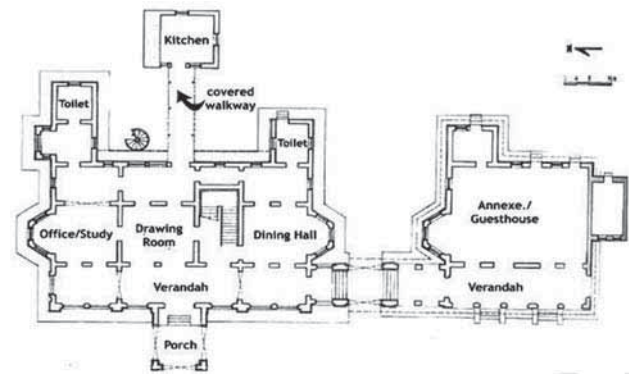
Ground Floor Plan of Flag Staff House, Karachi.
